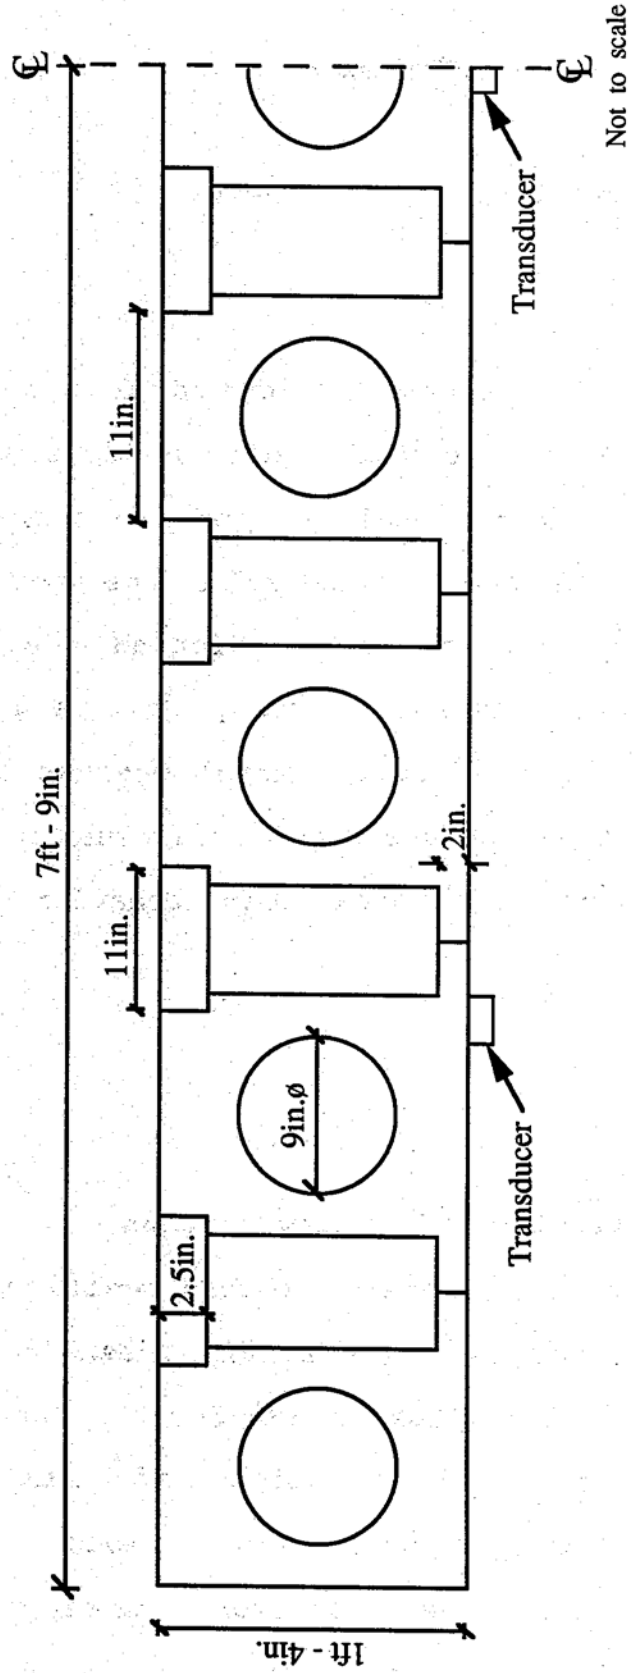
Typical cross section of the multi-box bridge model showing the transducer locations
